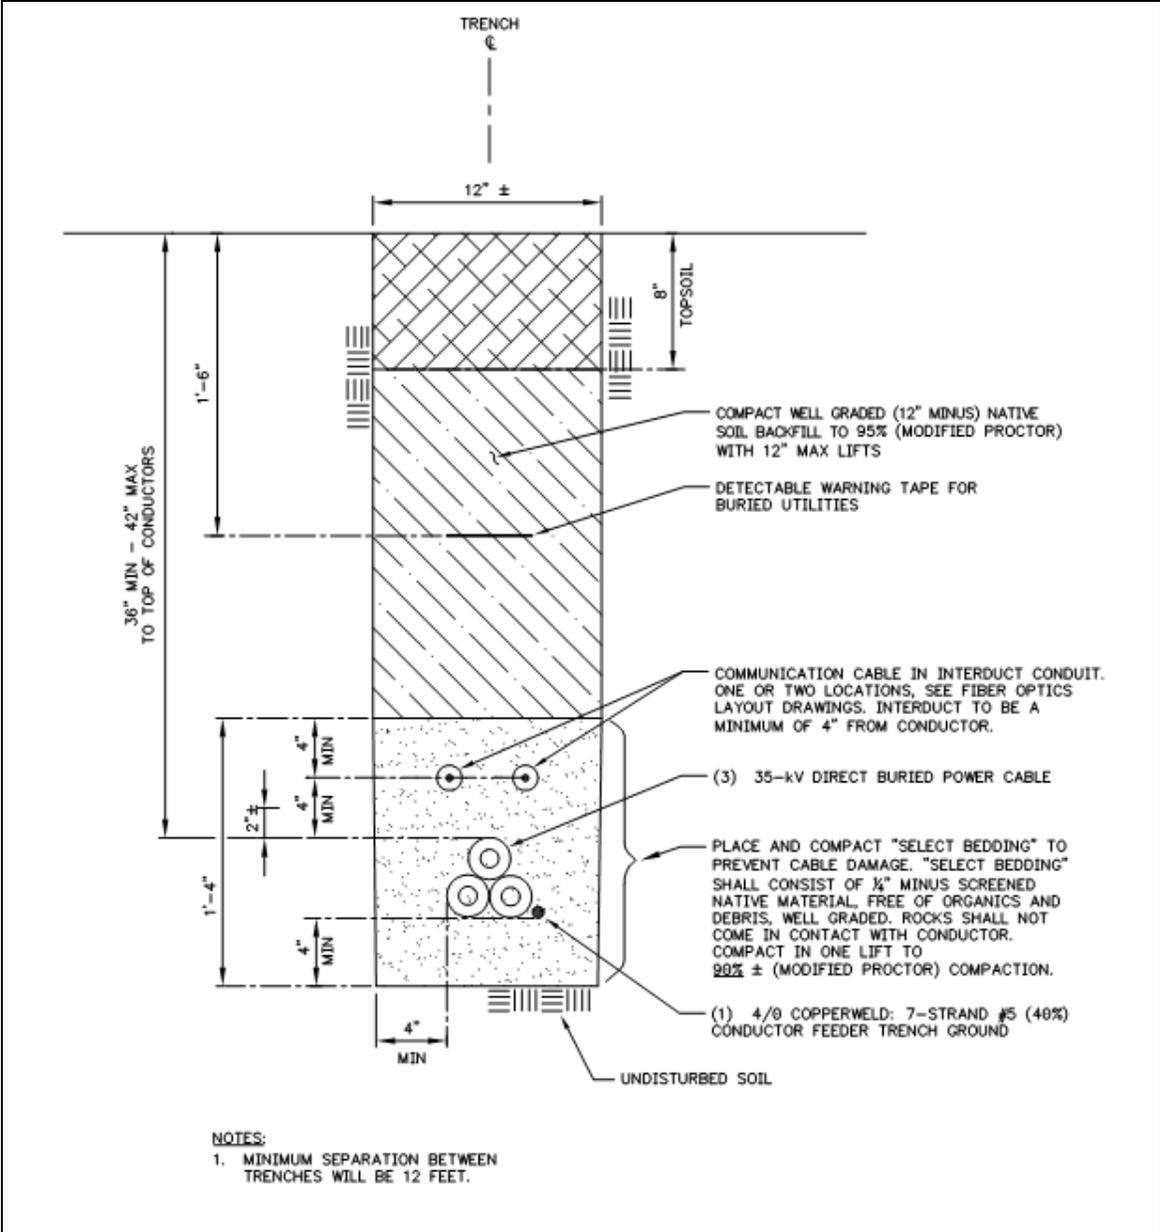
Typical Single-circuit Underground 34.5kV Collector Line Trench
